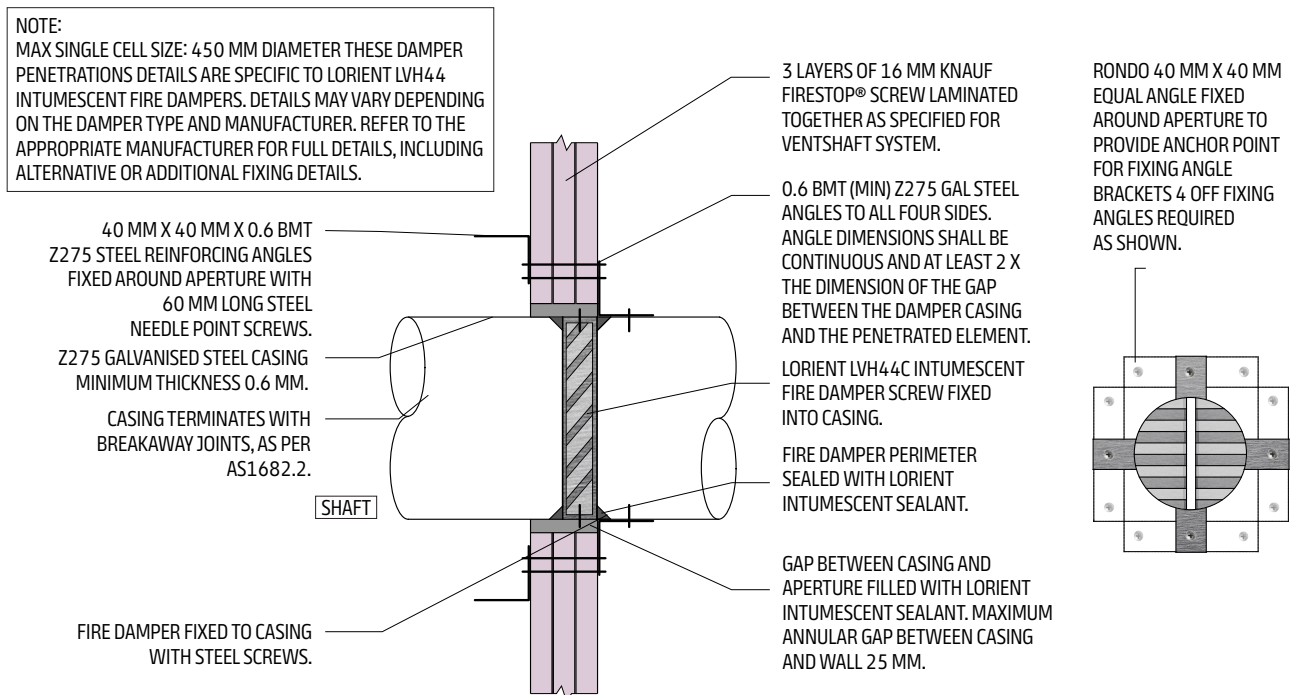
Lorient Fire Damper Section Detail 'B': Round Damper
